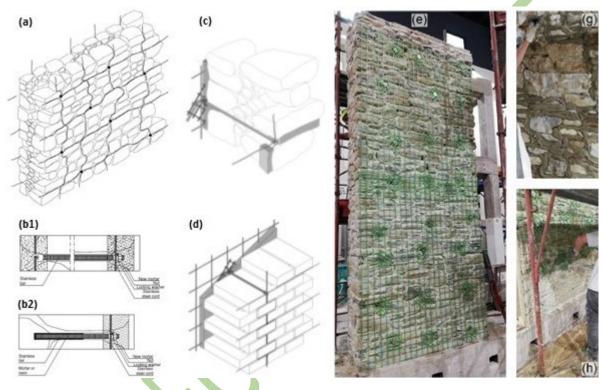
Stone wall strengthened with "reticolatus" system (a). Detail of through connectors (b1). Detail of not-through connector (b2). Hybrid application of "reticolatus" with GFRP jacketing for stone-masonry panel (c) and brick-panels (d). GFRP mesh laid over the internal side (e). Repointing of the mortar joints of the external side (g). GFRP jacketing of the internal side (h). Pictures from (Borri et al. 2014; De Santis et al. 2021)
